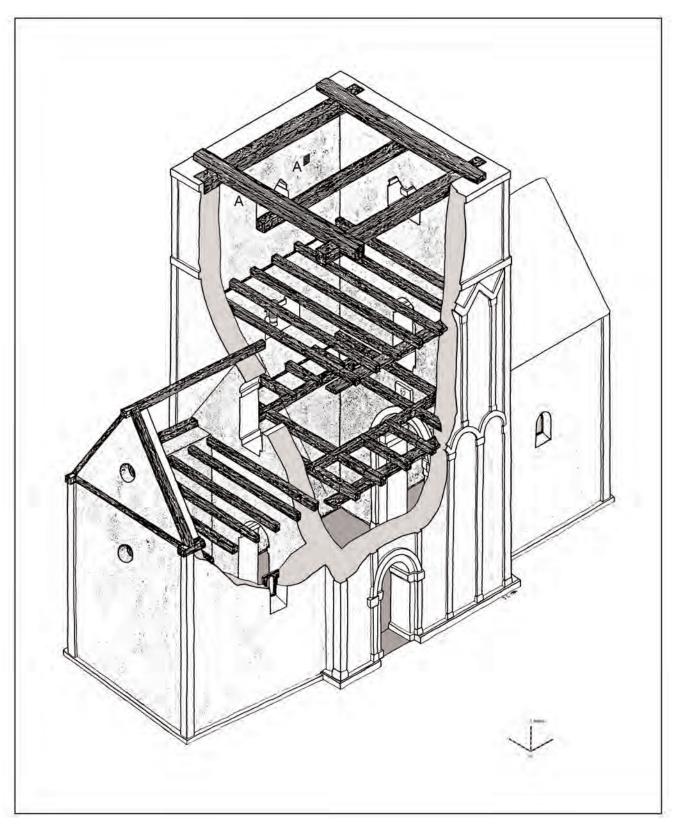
Cutaway isometric reconstruction of the floor and roof timbers in the tower-nave and baptistery, based on evidence encapsulated in the walls (cf. Fig. 301). Bell-hanging beams (AA) are omitted for clarity. View north-east. Drawing: Stephen Coll
